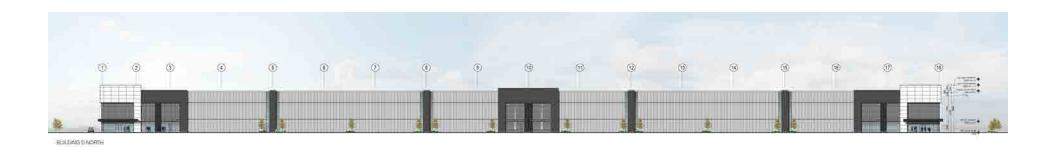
Concept Building Elevations prepared by Baldassarra Architects
